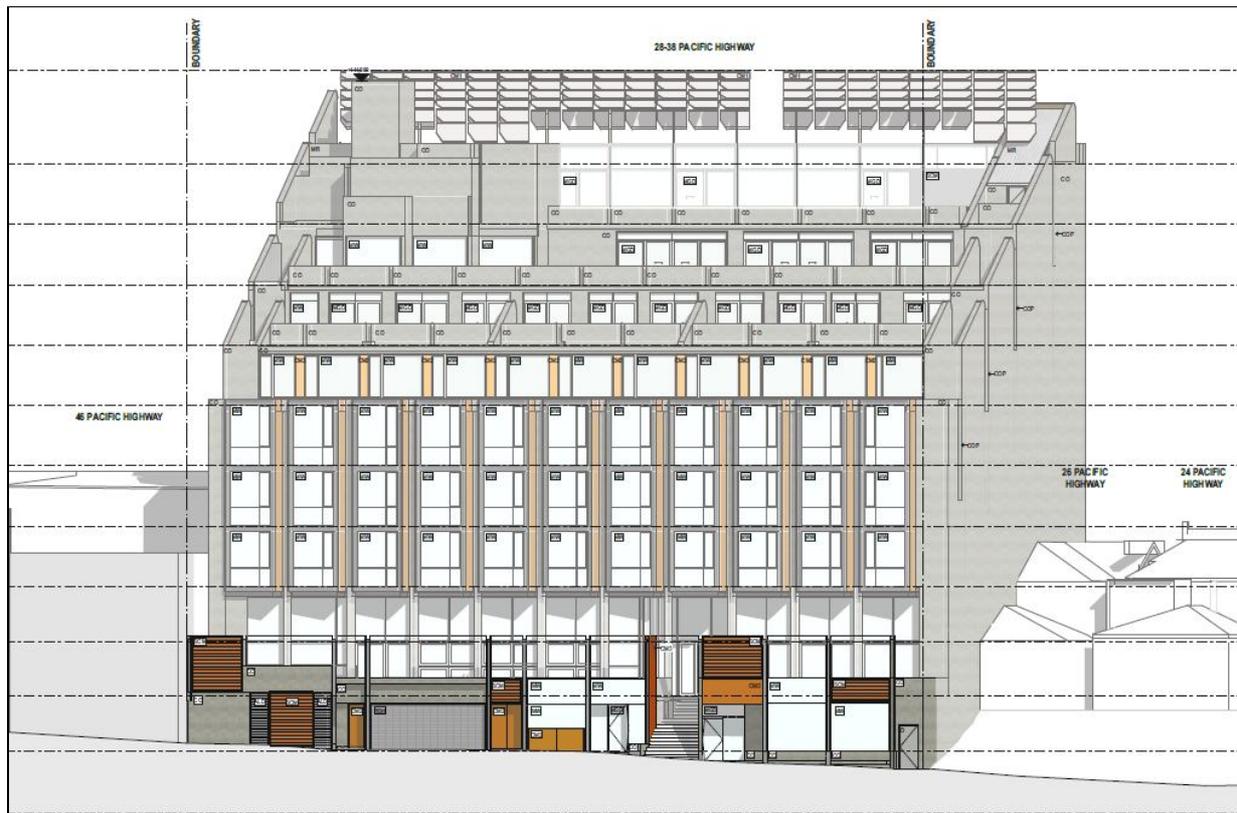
Marshall Lane (south) elevation. (Source: Tonkin Zulaikha Greer architects).
